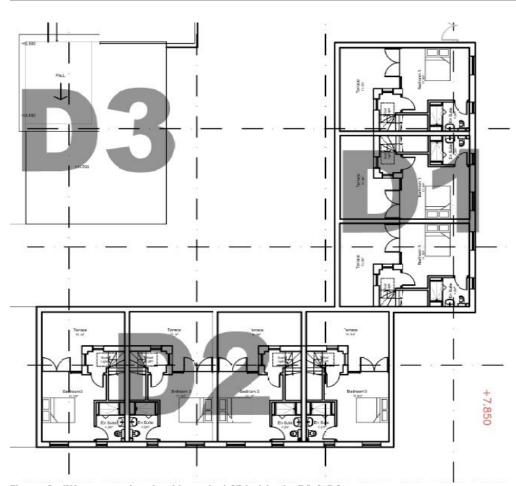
IW proposed revised layout at SF to blocks D1 & D2
